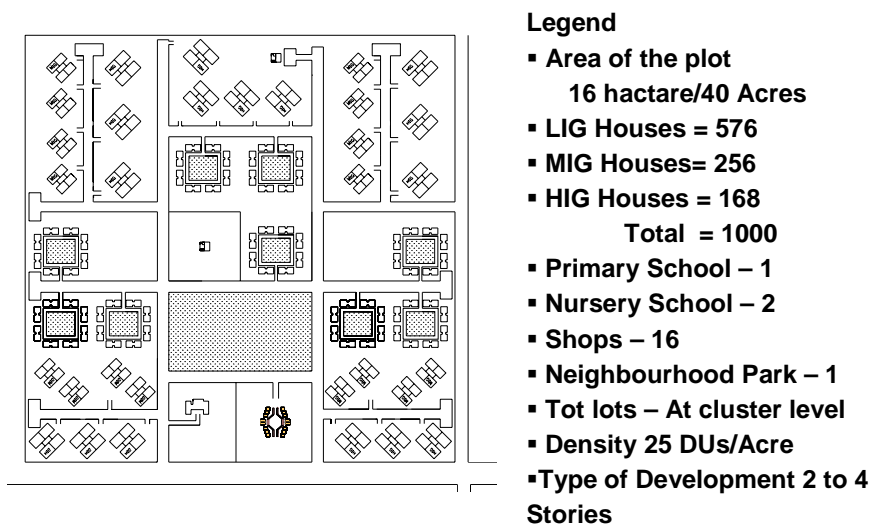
Settlement layout plan for a neighborhood of 5,000 population, Alternative – II
